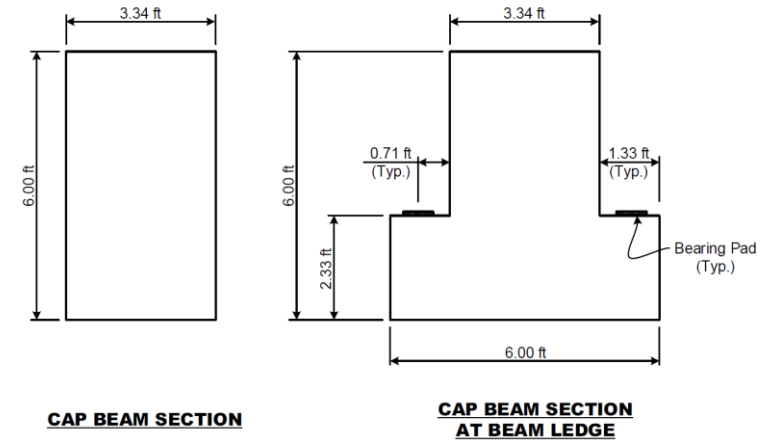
Typical Sections of Straddle Bent Cap Beam
